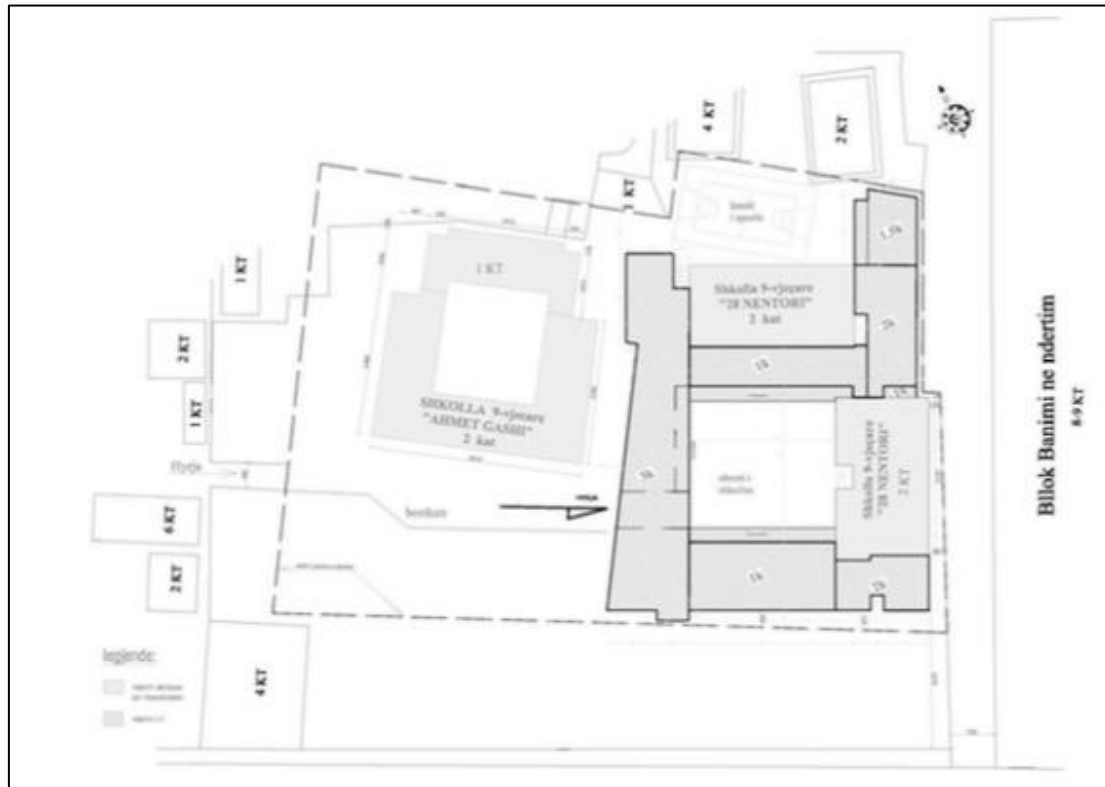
Existing school buildings together with the new additions (Courtesy of Adelina Greca, architect of the new buildings).
